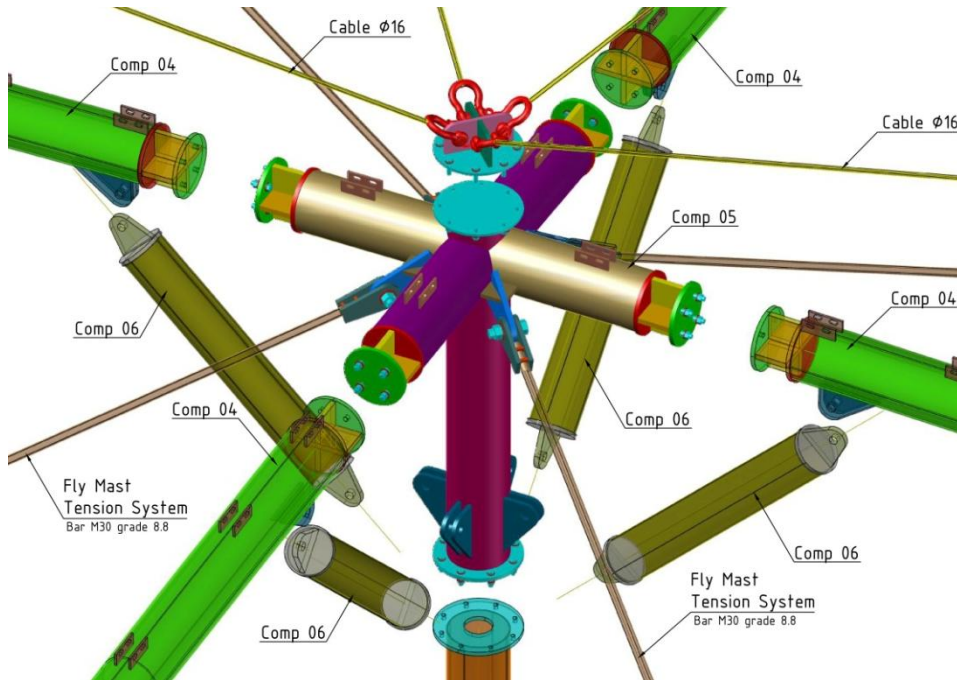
The above image shows the column detail and connection to the arches in center part of the structure, and also shows how fly mast tension systems and safety cables connect to the center column
